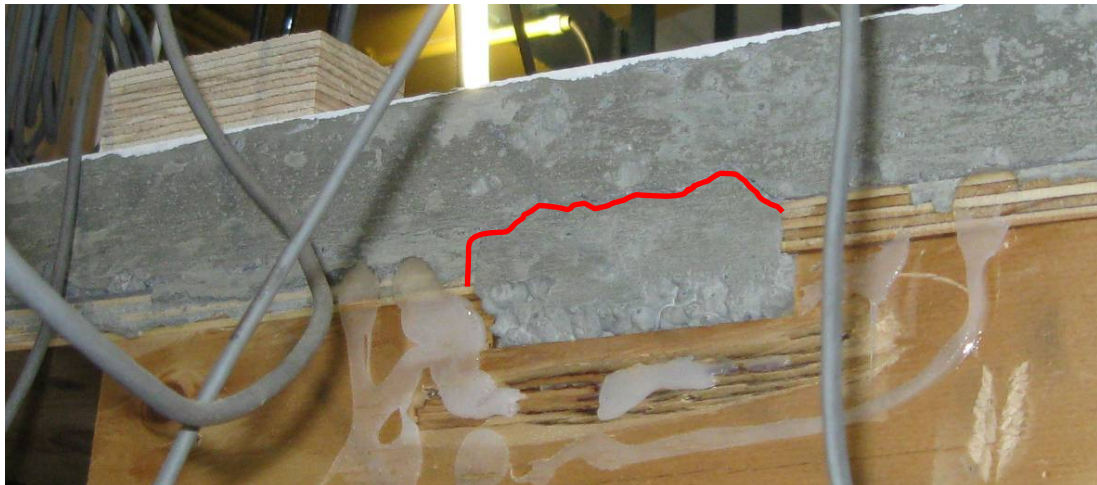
Slab cracking around edge beam connection at SE corner on Level 2
